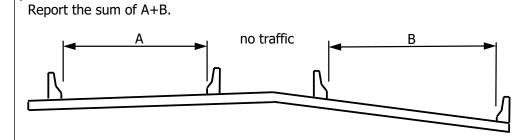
Cross-section view of a bridge deck with multiple median barriers.
